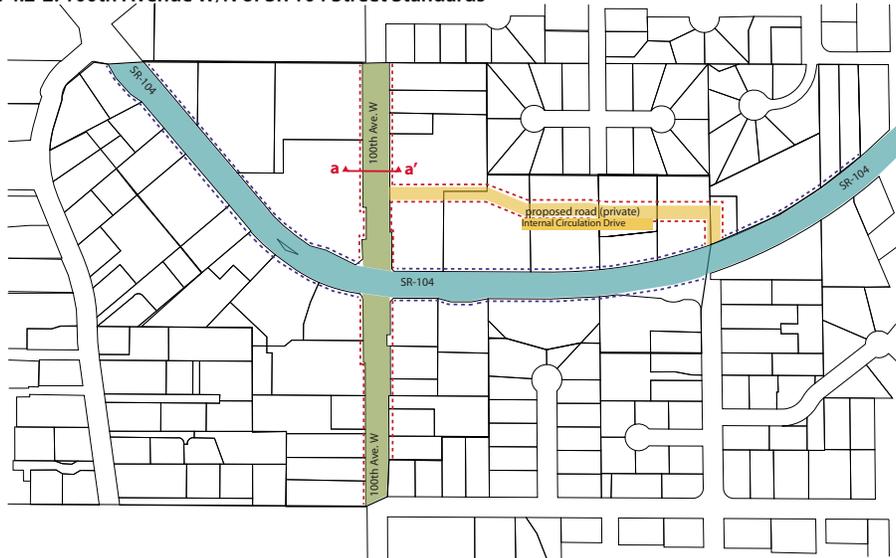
100th Avenue W/N of SR 104 Section Location Map
